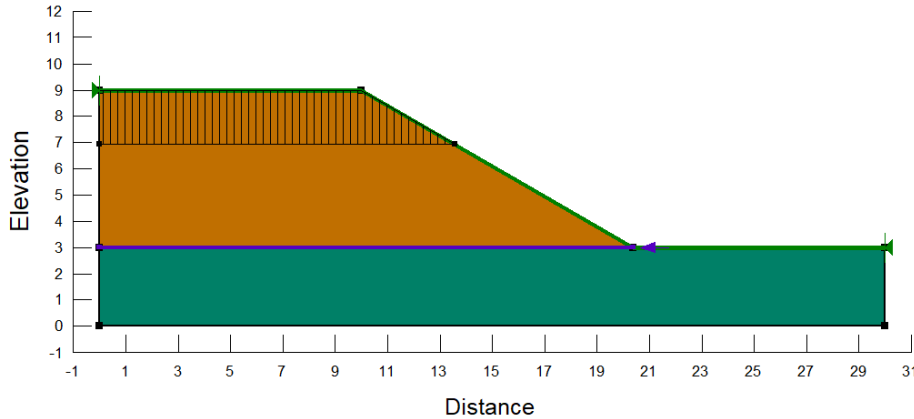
Clay Fill Embankment with Tension Cracks and Reinforcement
